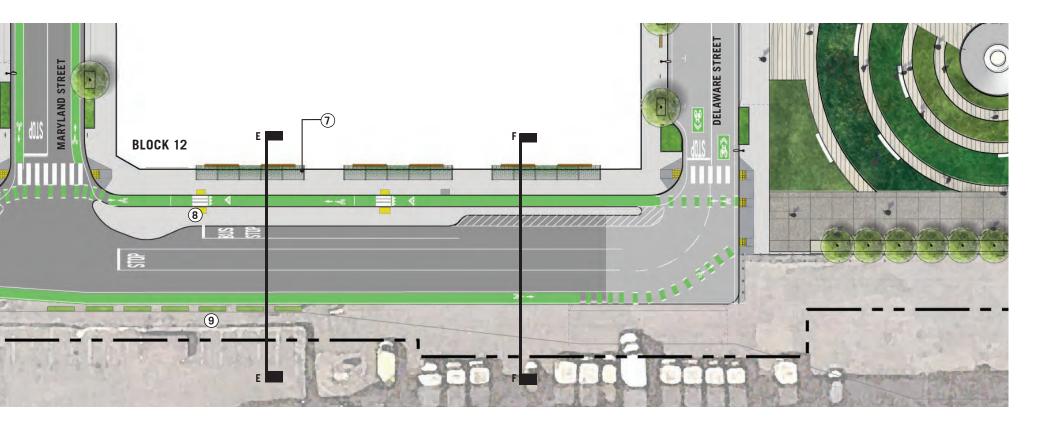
23rd Street Concept Plan (continued)
